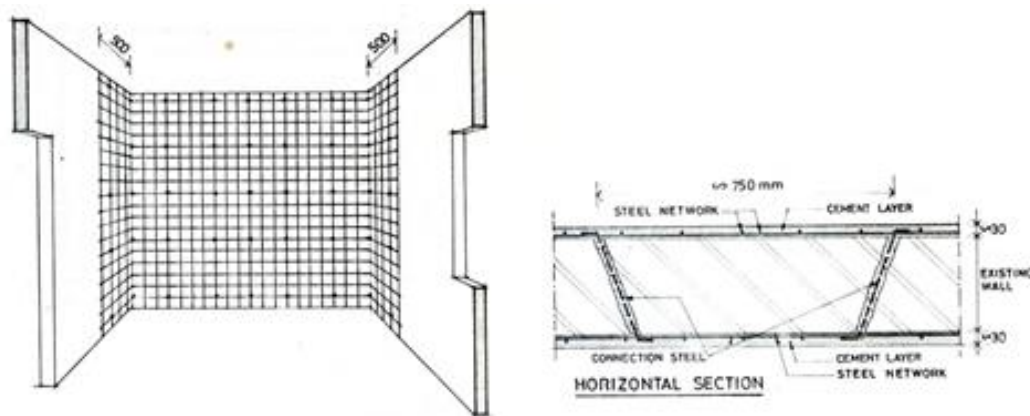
Vertical Reinforced Concrete Covering Plates (IAEE, 1980)
